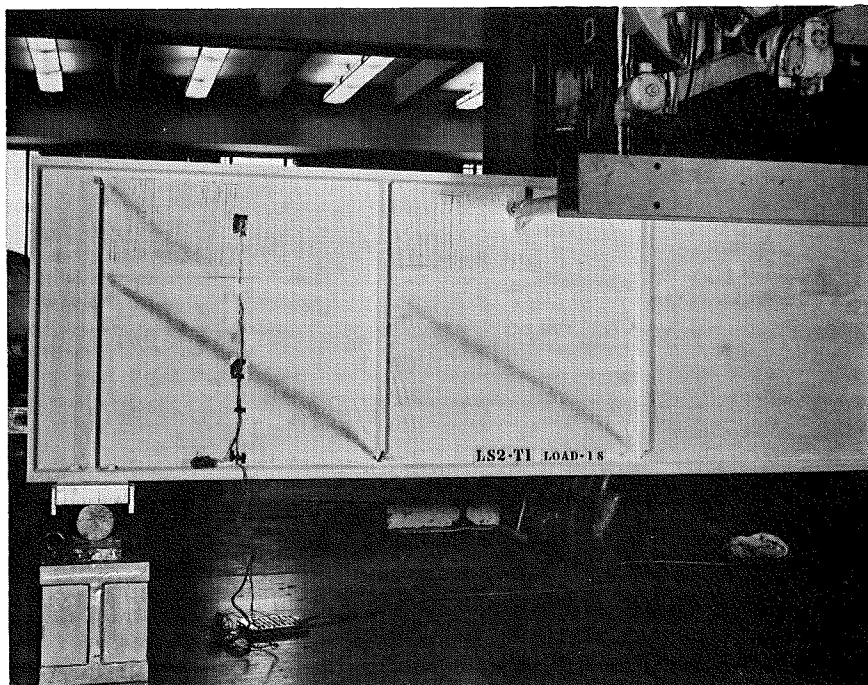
Girder LS2 at Load No. 18 (+ x end)
